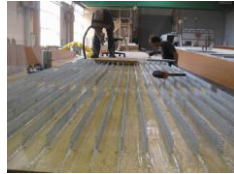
Detailing T-Pos 3 – Durability: constructional wood protection – Possibility 3: Closed road surface: sealing system
